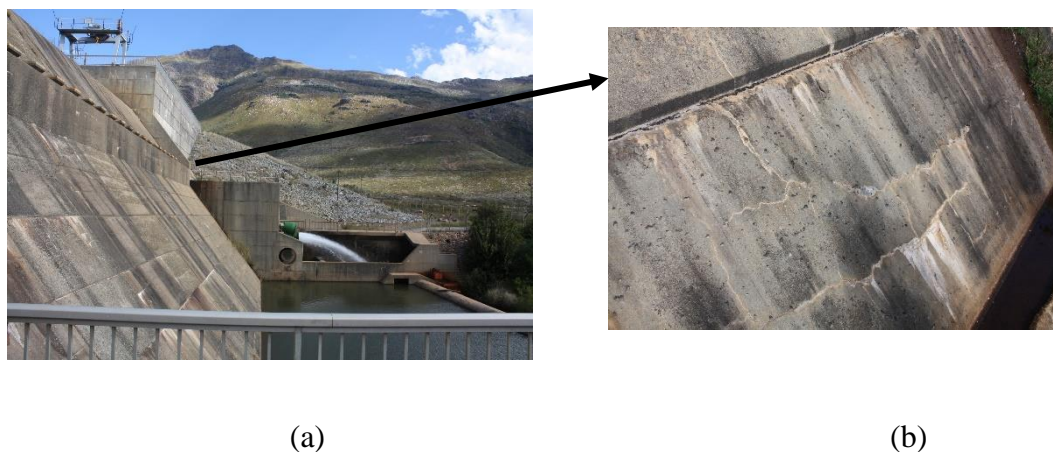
Kleinplaas dam, a concrete gravity dam in the Jonkershoek River in Stellenbosch, a) a view from downstream of the dam, b) damage and cracking in the downstream wall.
